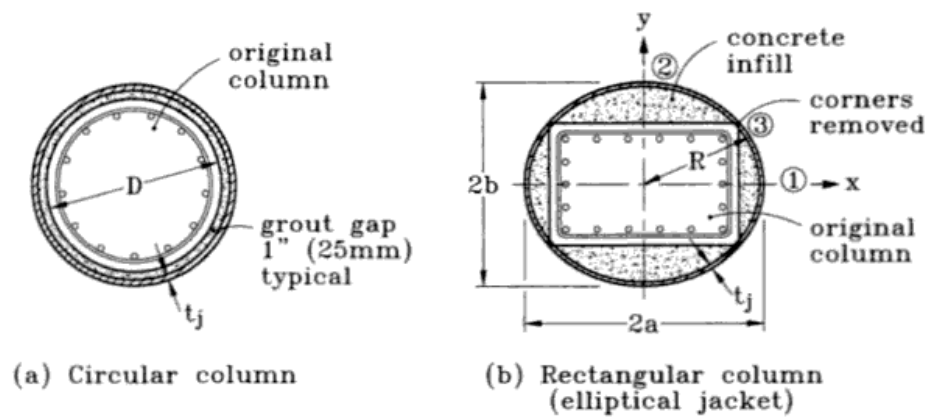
Confinement of columns by steel jacketing (Adapted from Priestley et al. 1996).
